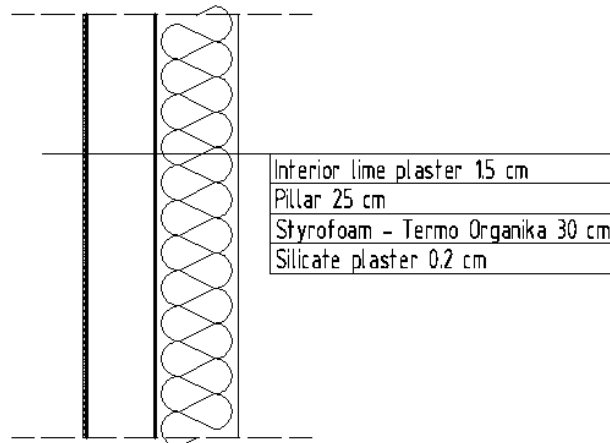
Structure of the exterior wall with concrete column covered with plaster.
